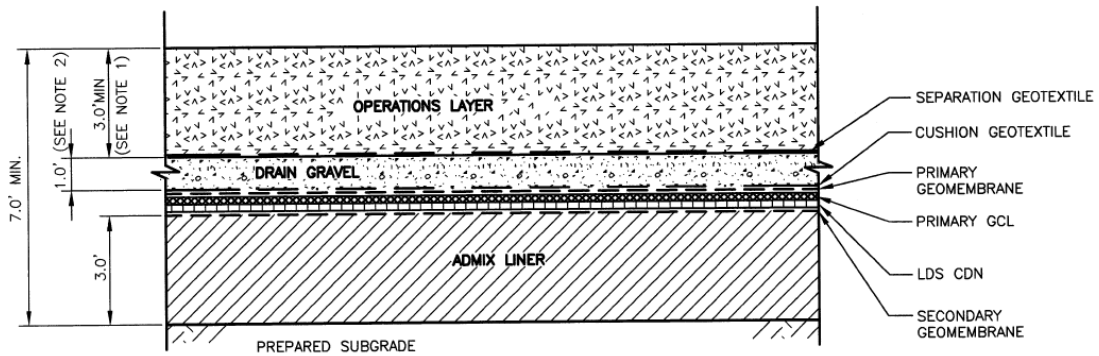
Integrated Disposal Facility Planned Layout Configuration
